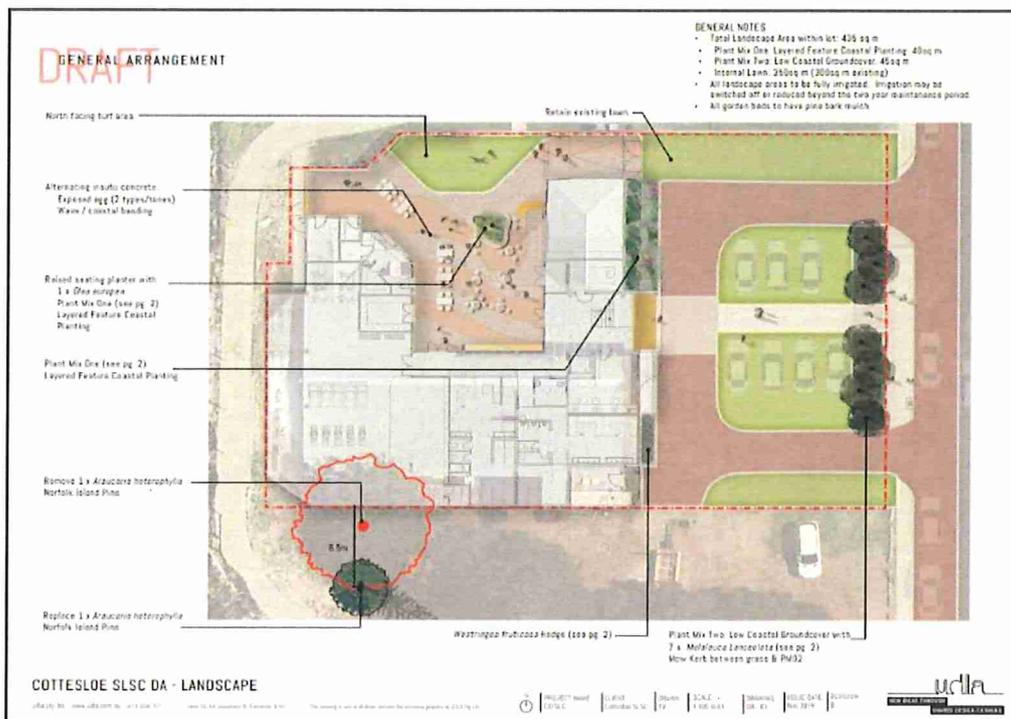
Excerpt from Cottesloe SLSC DA Landscape Plan. (UDLA, December 2019).
